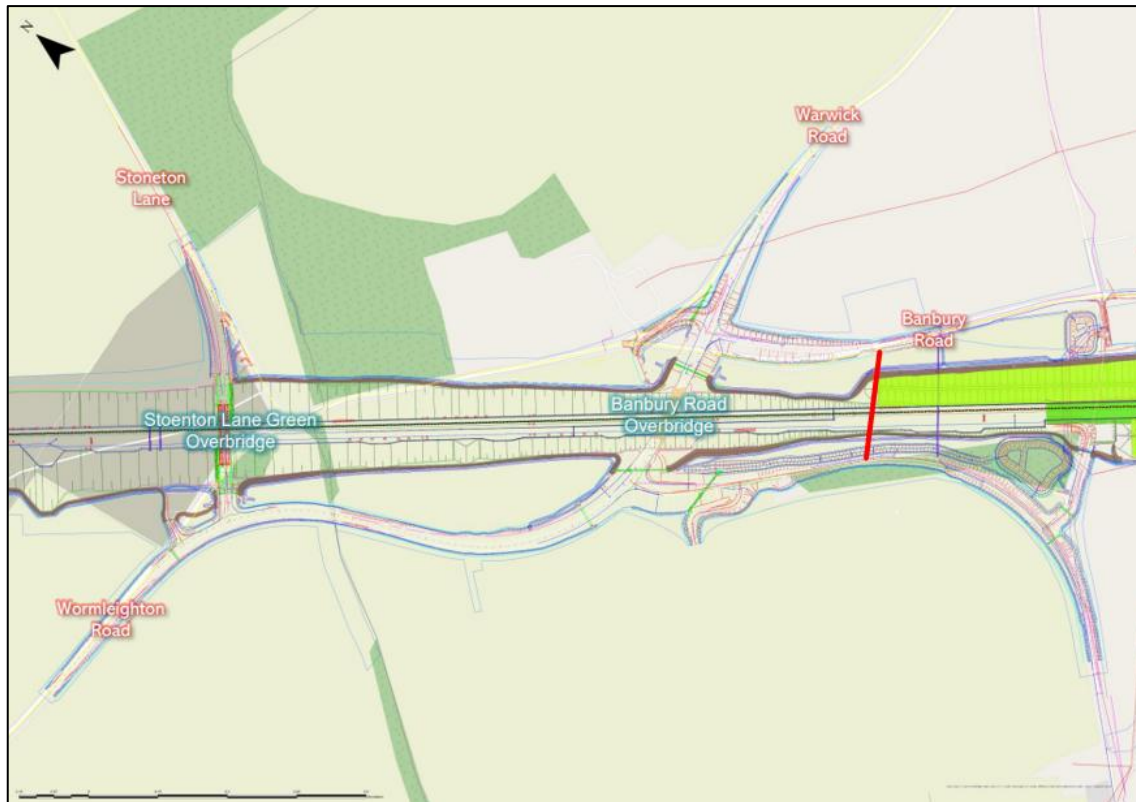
Temporary link road (red) connecting Banbury Road and Wormleighton Road
